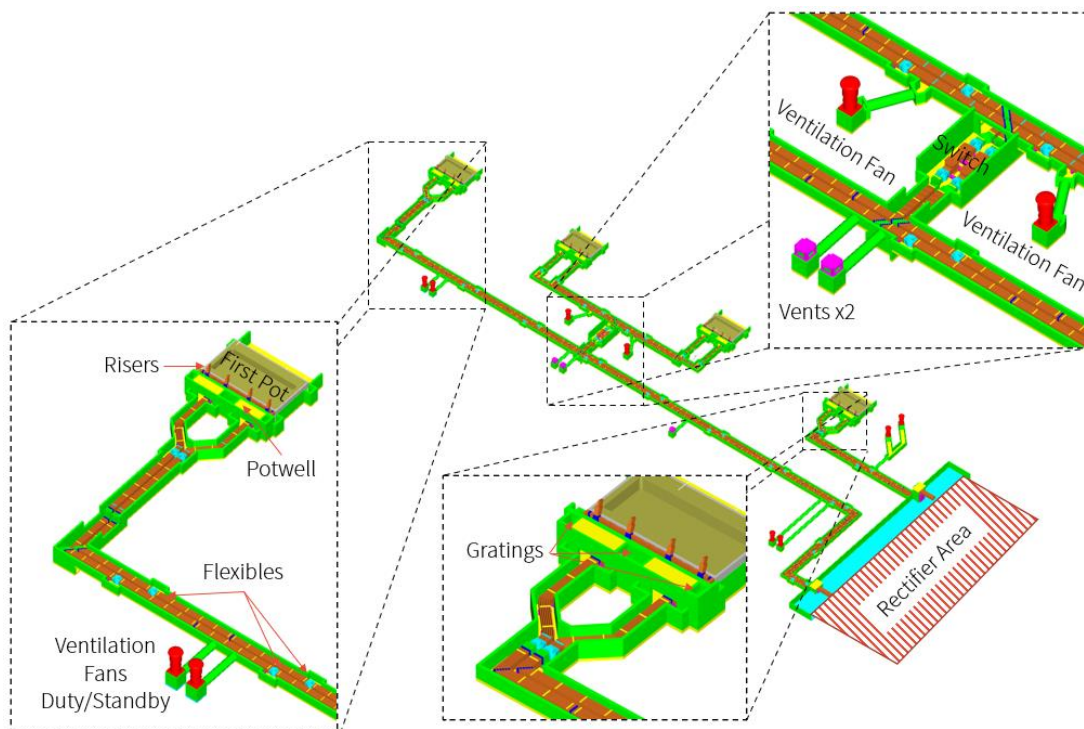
Potline 7 3D model highlighting typical busbar ventilation tunnel components (tunnel concrete covers not shown for clarity).
